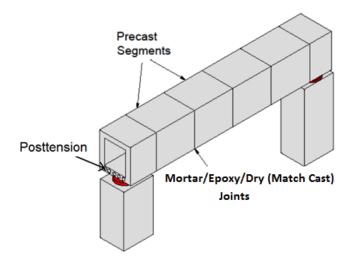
Precast segmental bent cap (Source: CSU 2015)
